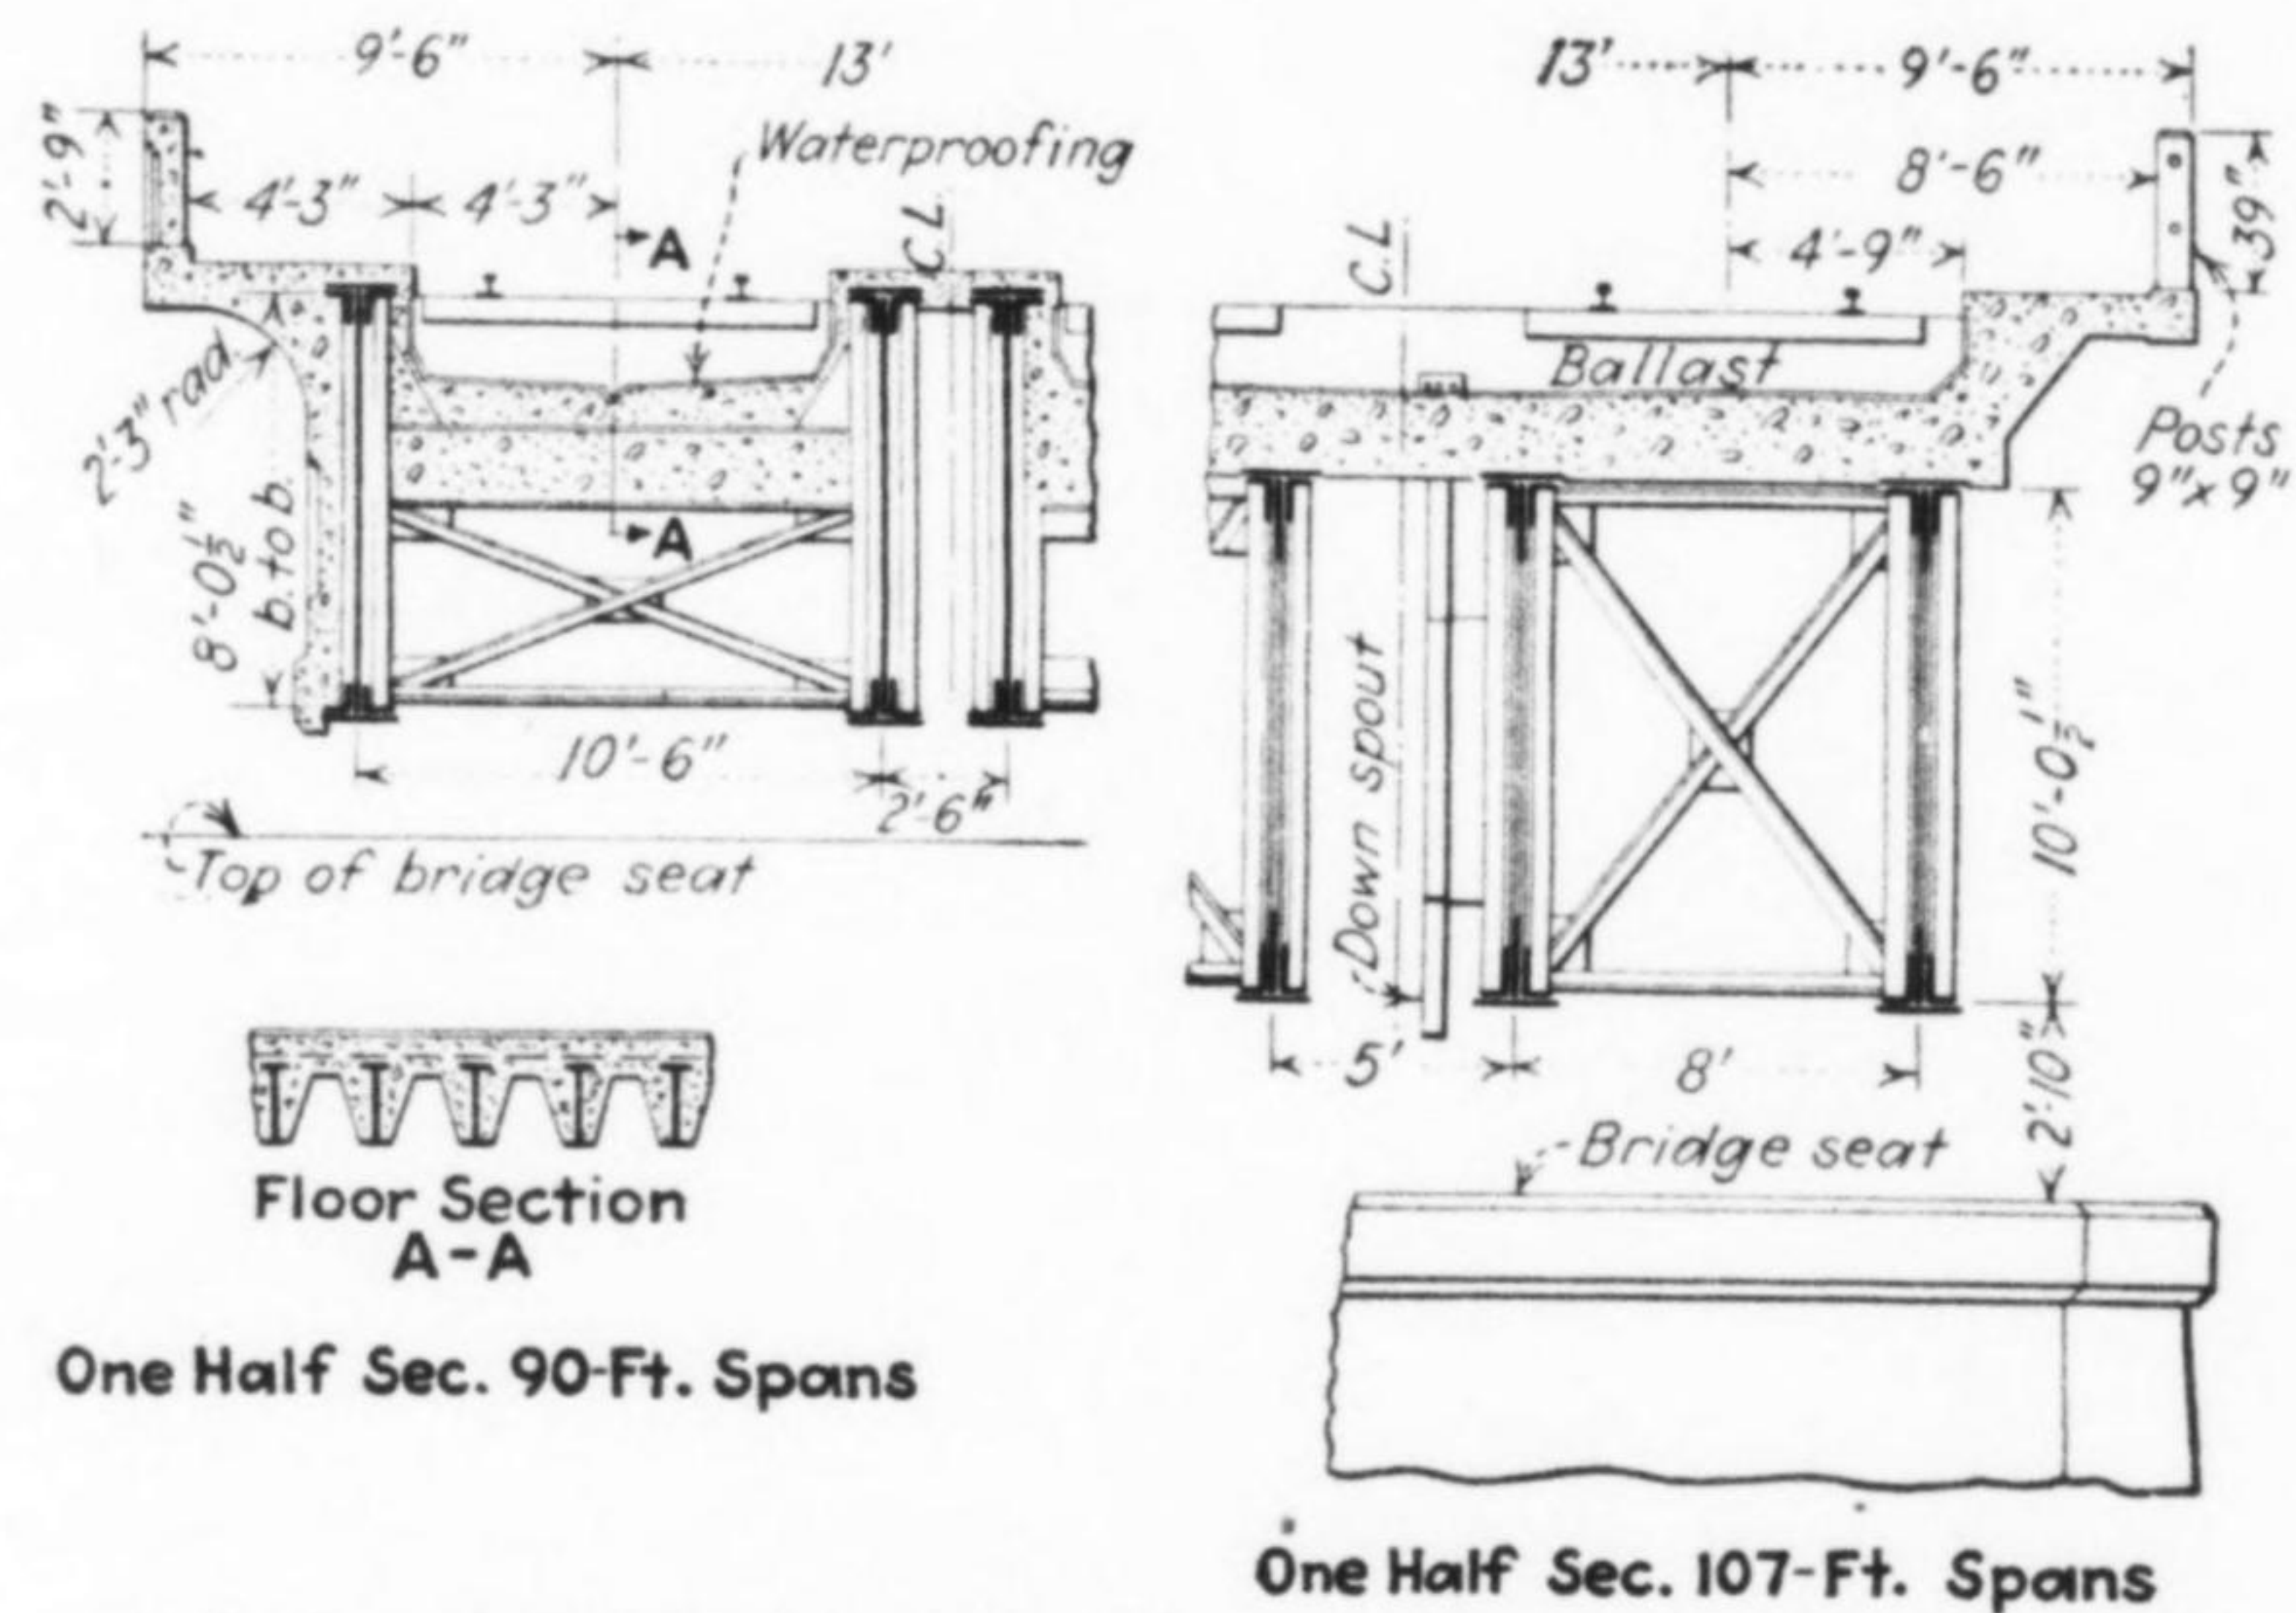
GIRDER SPANS, ST. JOSEPH RIVER BRIDGE
